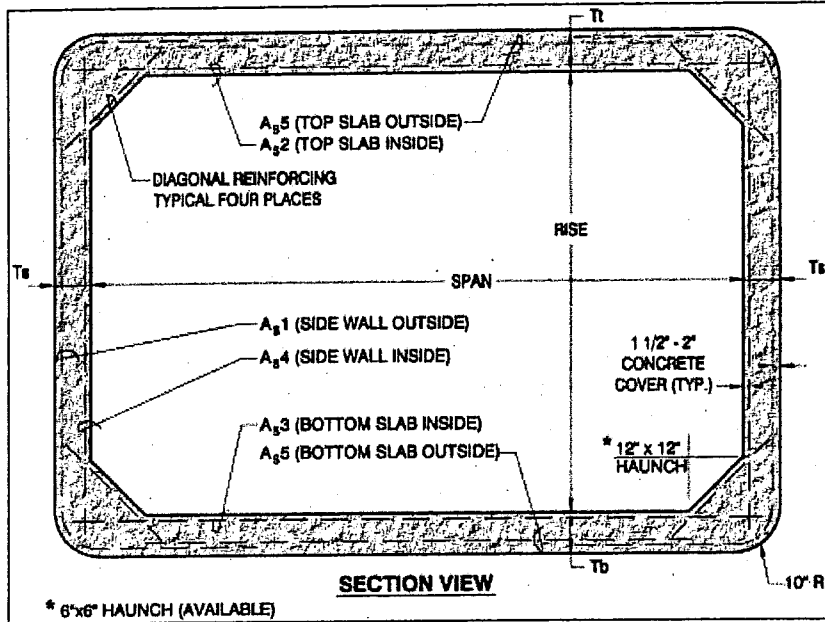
Standard MnDOT Precast Concrete Box Culvert²²
